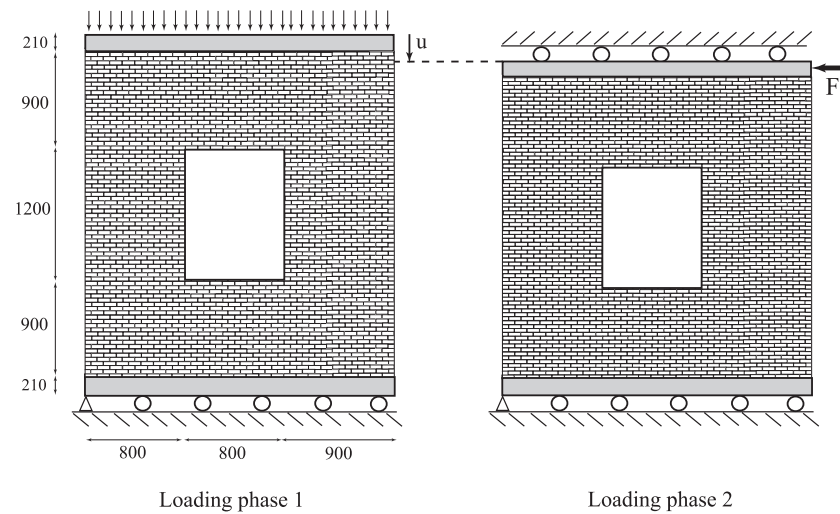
Shear test on a wall with opening: two-phase loading and dimensions
